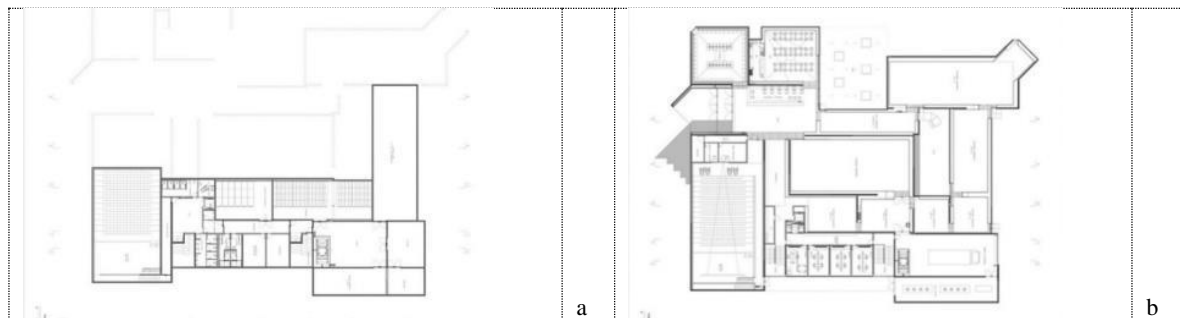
a. Paula Rêgo Museum Basement plan, b. Paula Rêgo Museum ground floor plan (URL-195)
